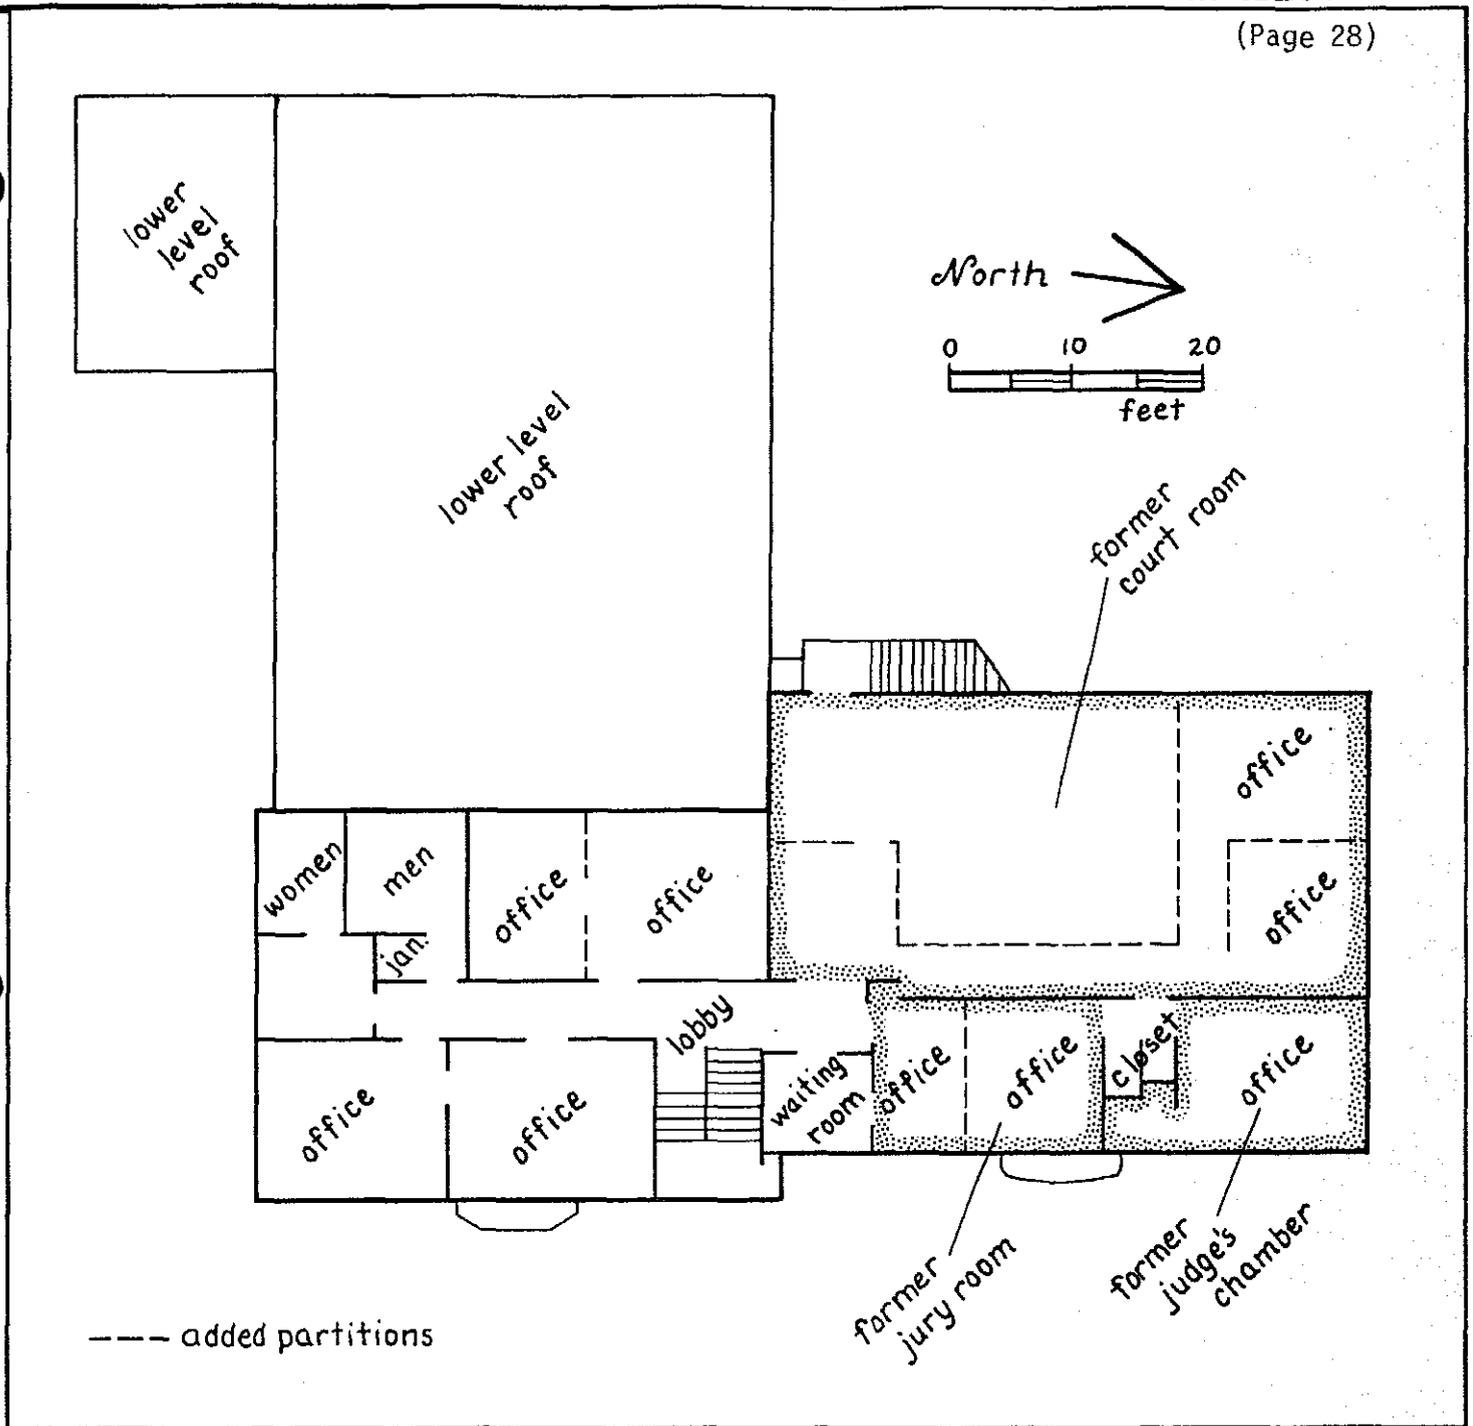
Second floor plan of the former Memorial Hall and Courthouse/Library. (From: Architectural Resource Group 1988.)
